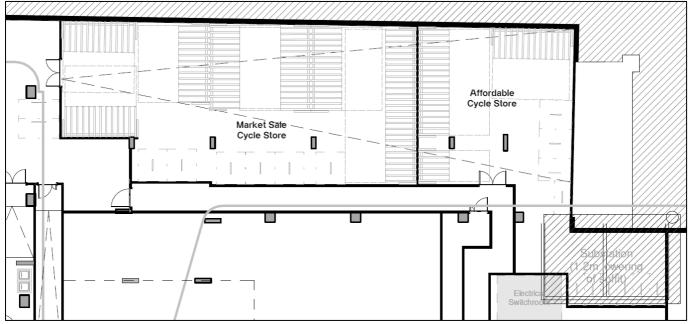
Basement Plan Extract showing Long-stay Cycle Parking
